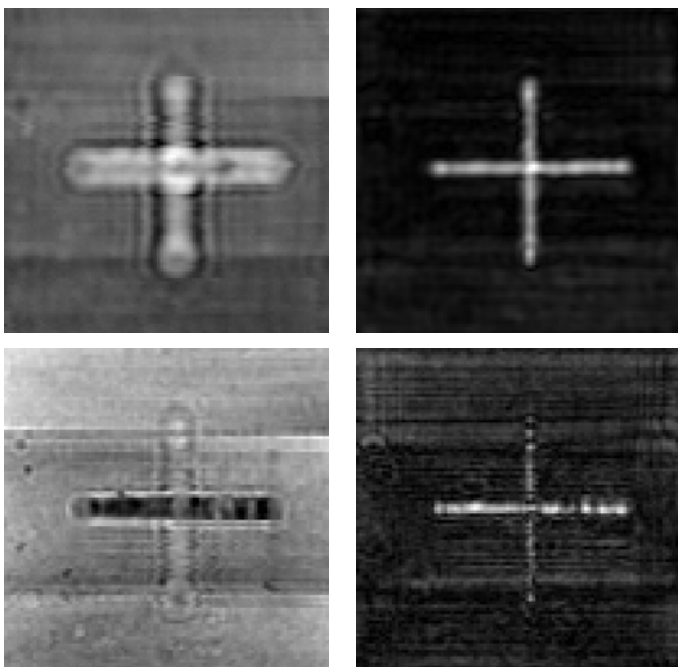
Crossing reinforcement bars under a foam concrete block at 6.6 GHz (top row) and 14.6 GHz (bottom row). Left column — holograms, right column — reconstruction.
